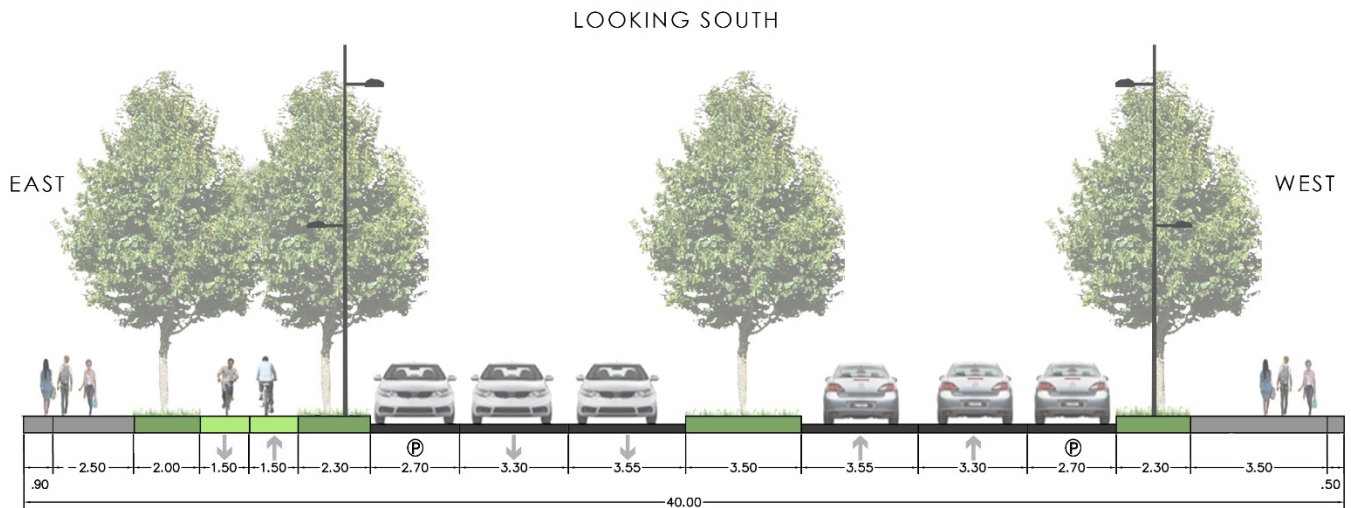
B: SHERWOOD DRIVE FROM OAK STREET TO BRENTWOOD BLVD SOUTH (40 M)
